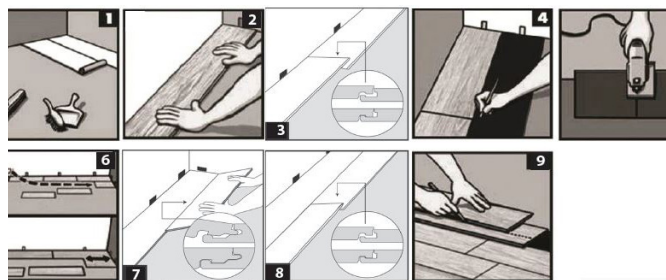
If you are using a sabre saw, or other type of power saw, place the plank face down on the work area and cut to size. If you are cutting with a hand saw, use a fine tooth blade and cut the plank with the face up. Insert the cut plank into the row and use a pry bar to ease the plank into position.
